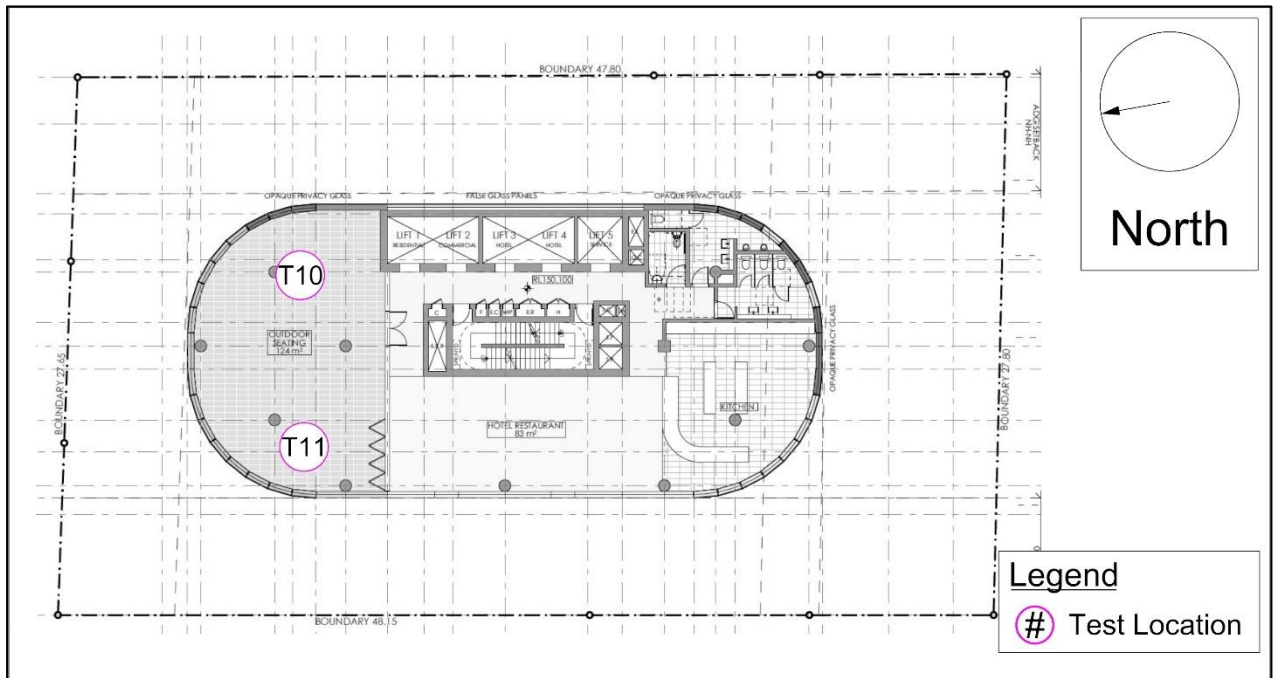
Level 36 Test Locations for the proposed 2-4 Burleigh Street and 20-24 Railway Parade Development.
